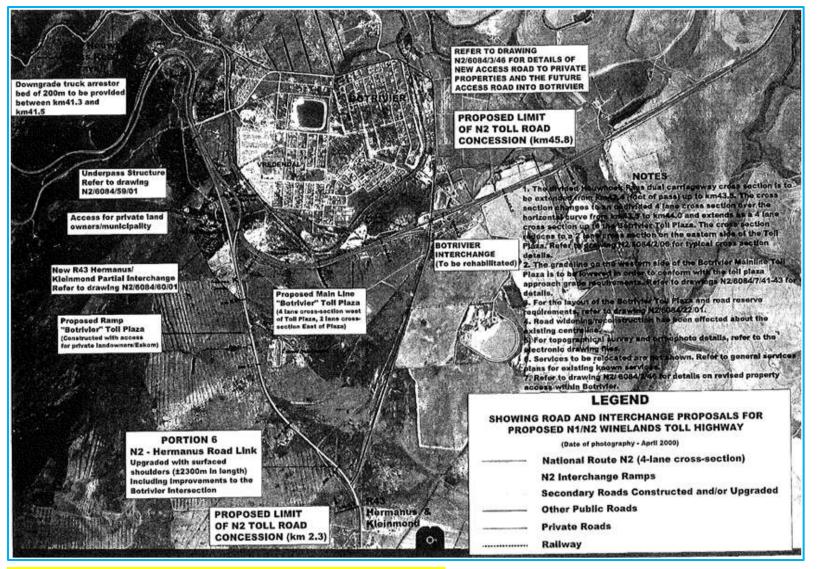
Planned Road Network Improvements (N2 Toll Consortium)
